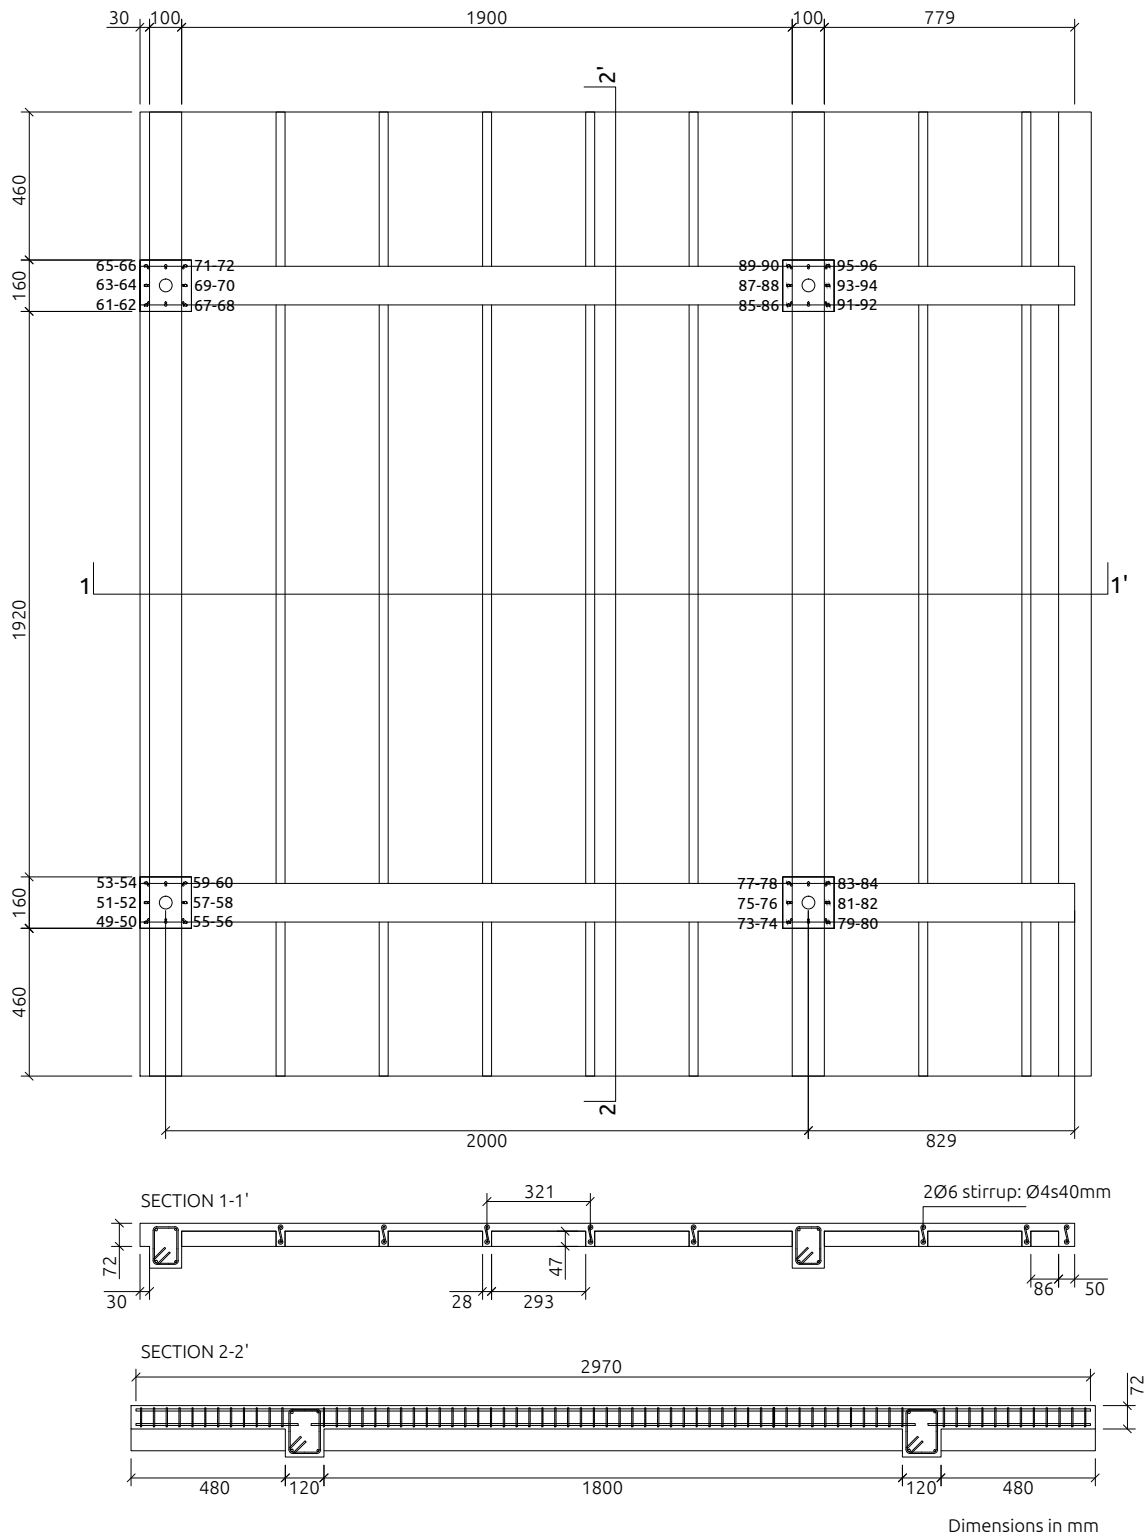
Model geometry. Ground floor columns top sections. Joist-band floor system definition
